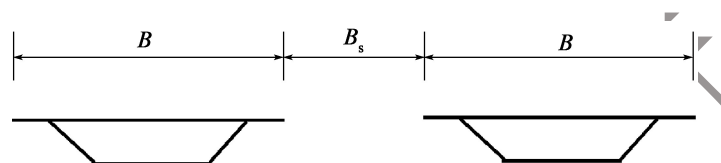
Schematic for main girder layout of a twin-deck bridge
